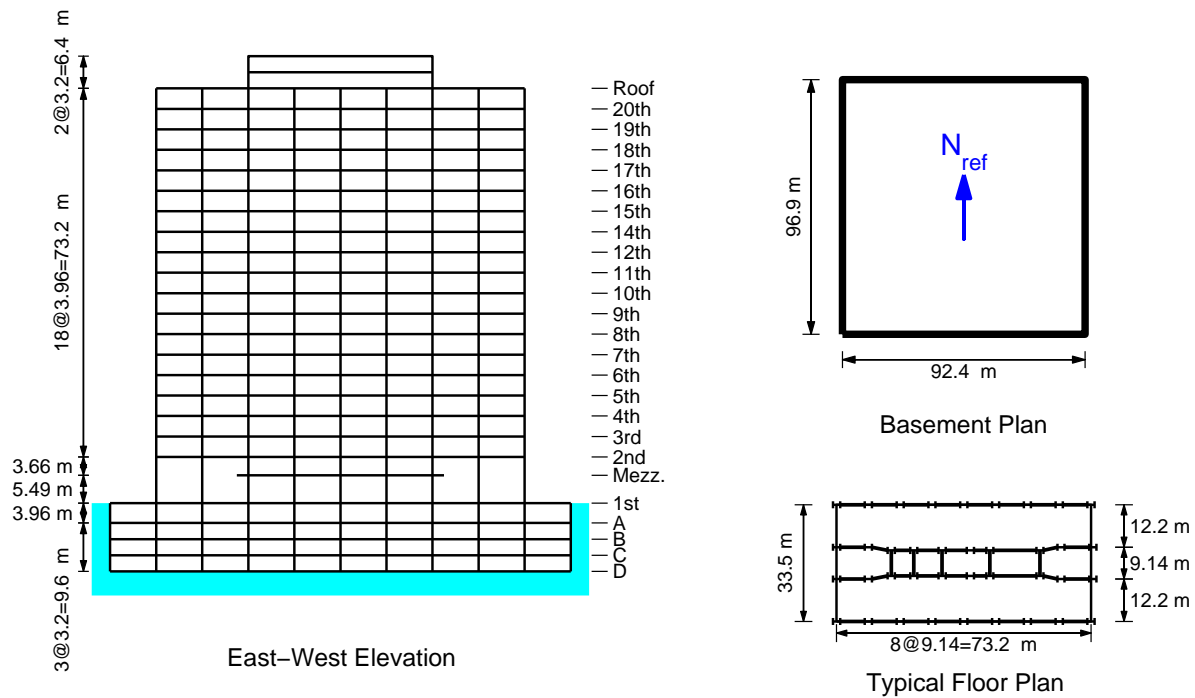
Elevation and plan of 19-Story Office Building in Los Angeles.
